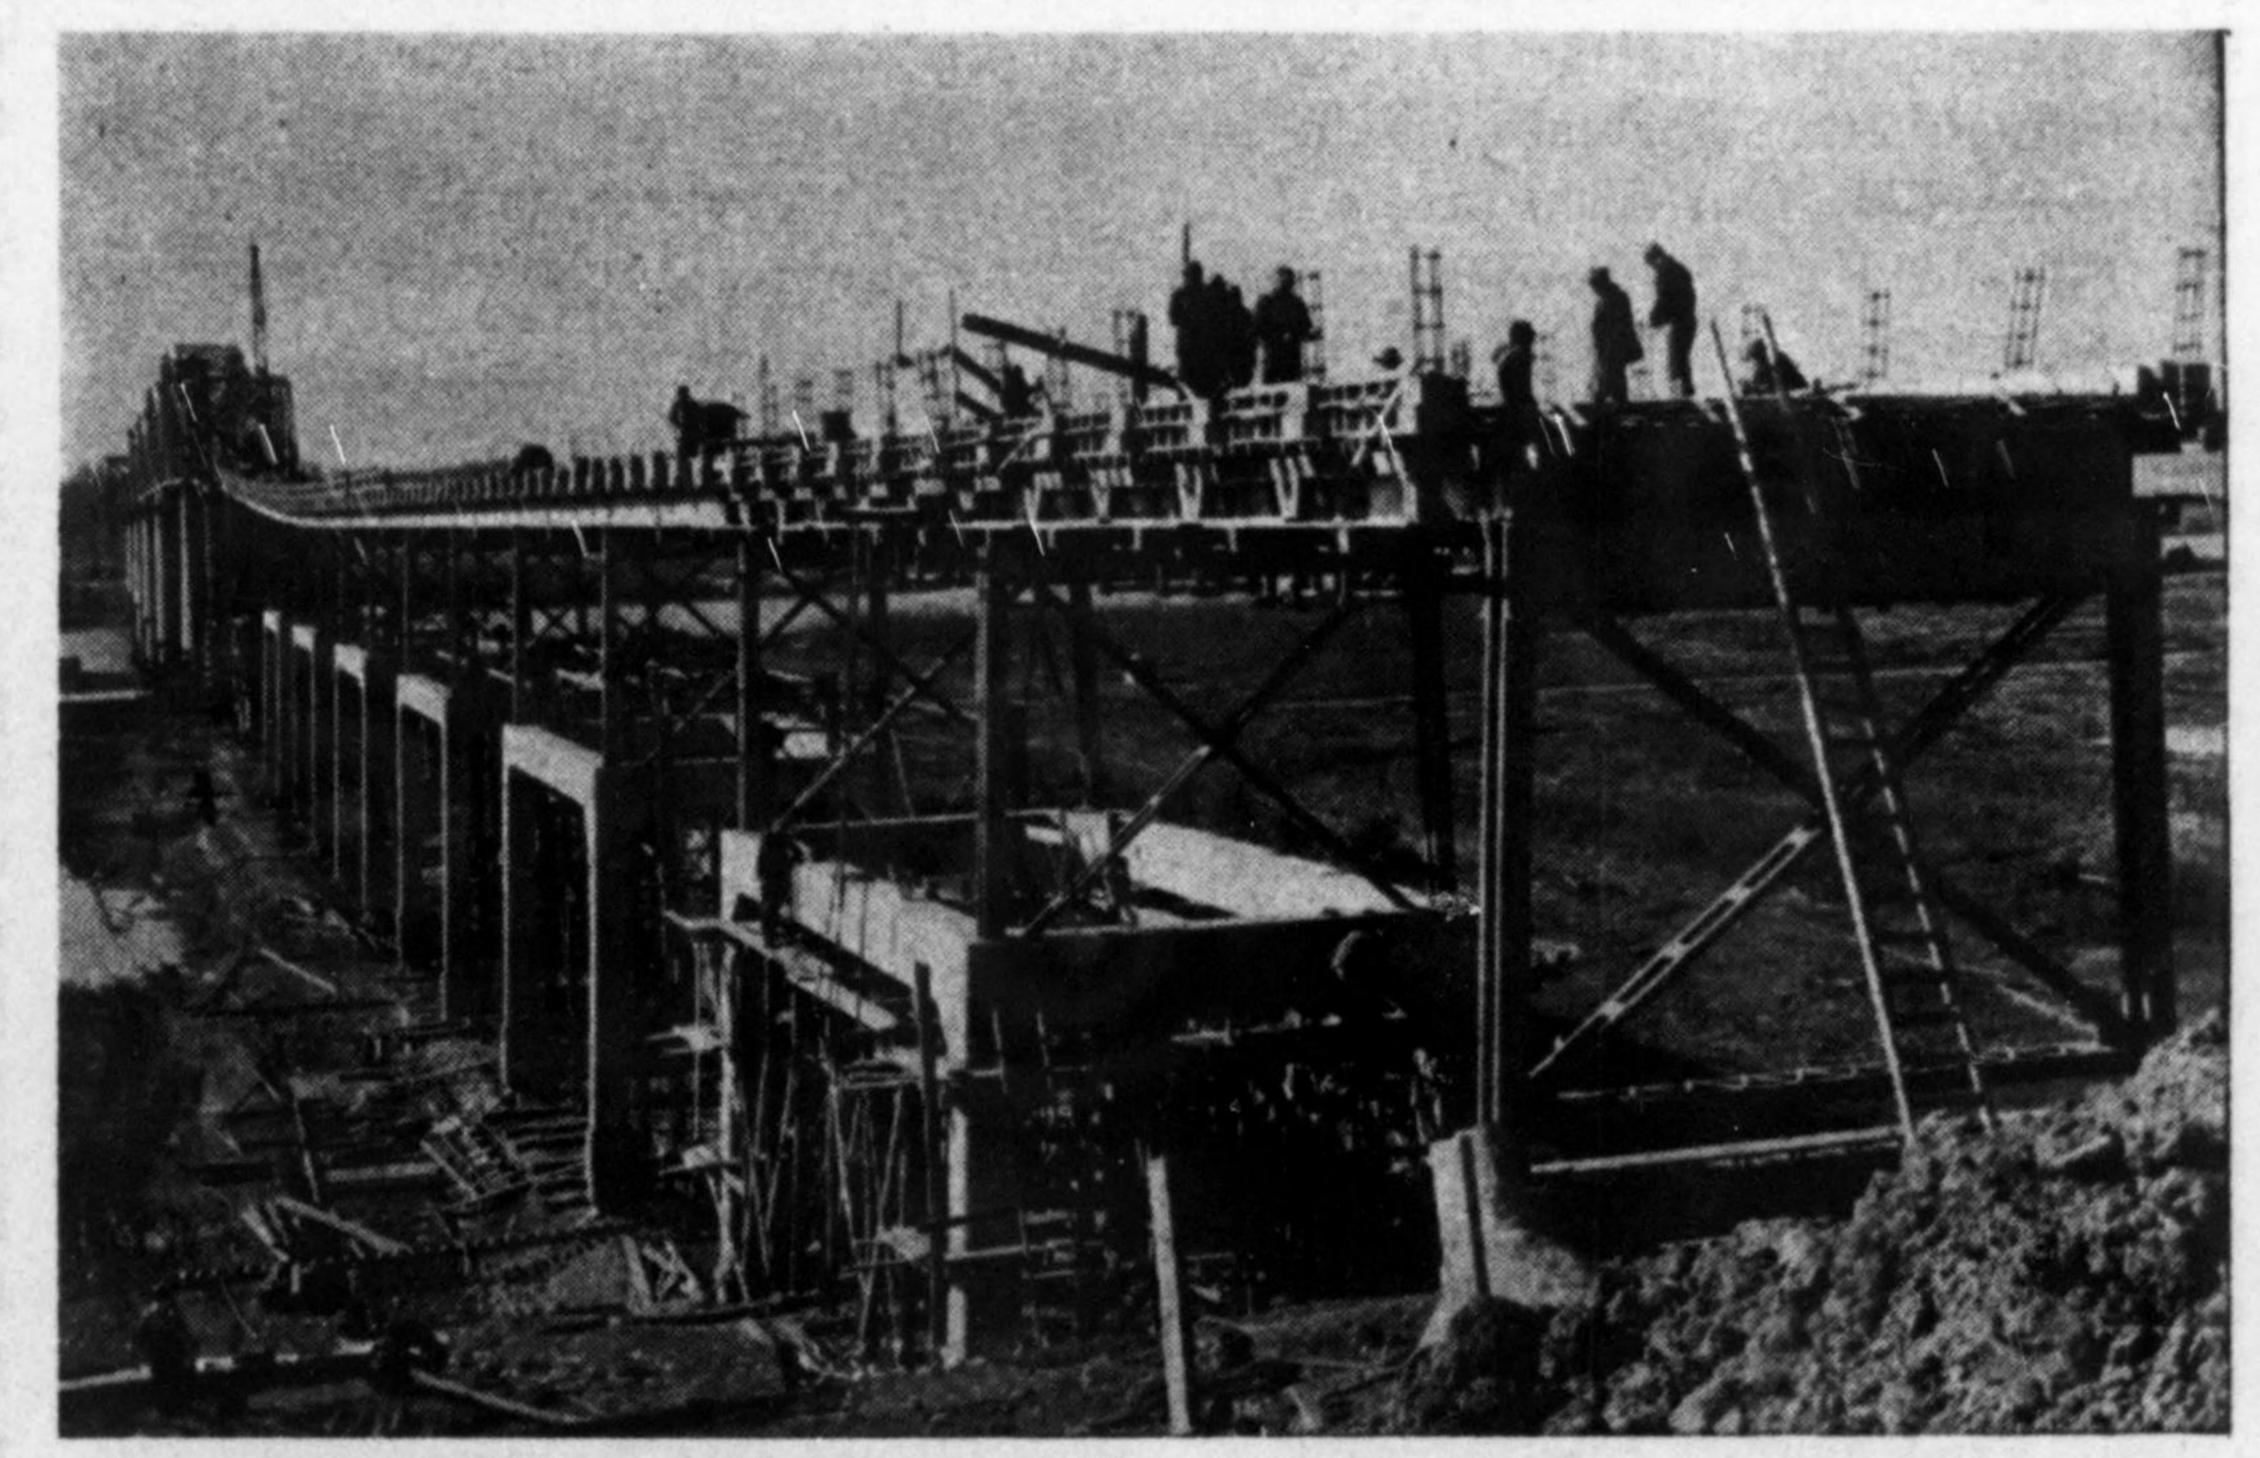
Work of raising east approach nearing completion, erection of old steel on new concrete towers having been completed. Changes of grade of deck, which required addition of new handrails with vertical posts, were accommodated by embedding the lower portion of the old steel in the concrete.
